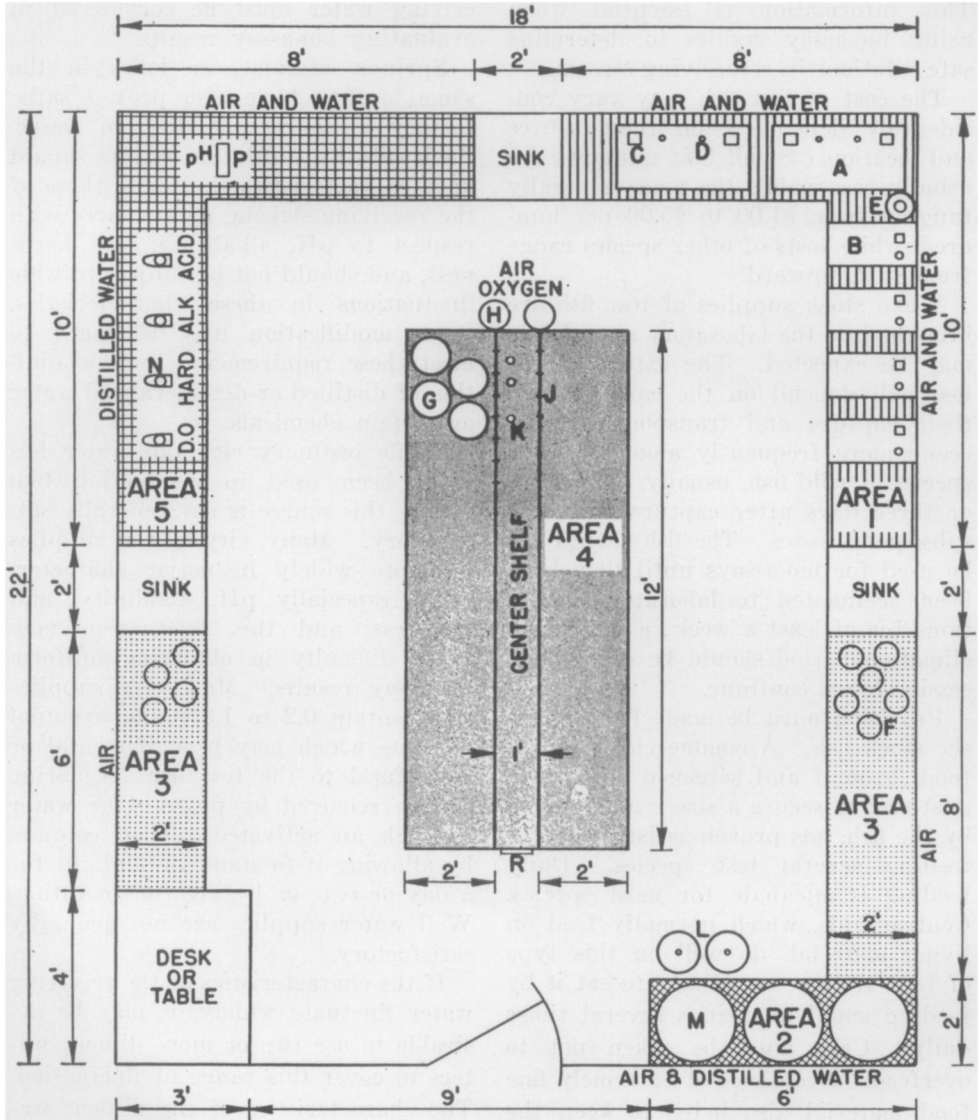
Floor plan of a proposed bio-assay laboratory.
